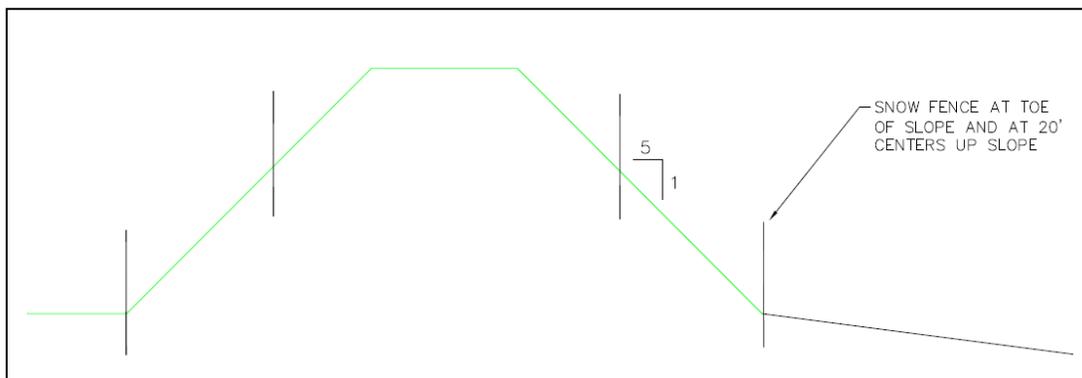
Basic dune cross section, with 5:1 slope shown. Also snow fence at toe and up slope at 20 to 30 foot centers
